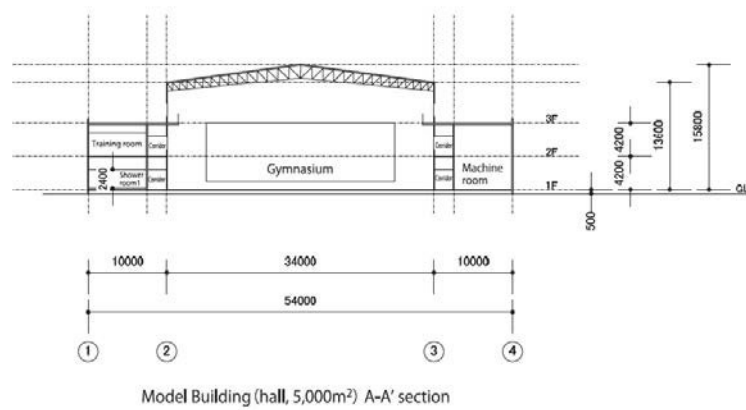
Model building (hall, 5 000 m²) A-A' section
